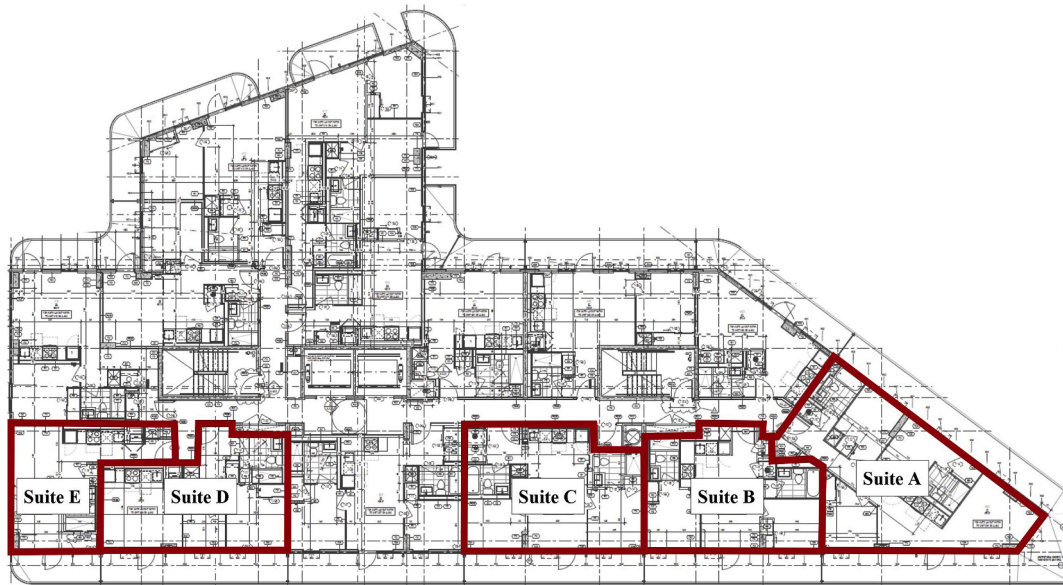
Level 6 floor plan, showing Group #2 test suite locations (Group #1 used the same test suites).
